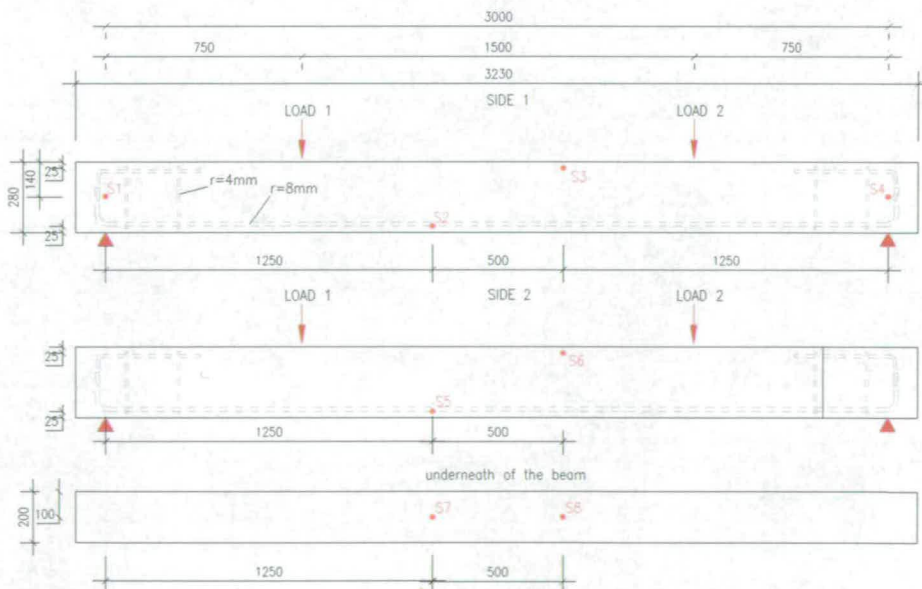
Design details, test configuration and resonant sensor location (S1 to S8) of beam BF3.
